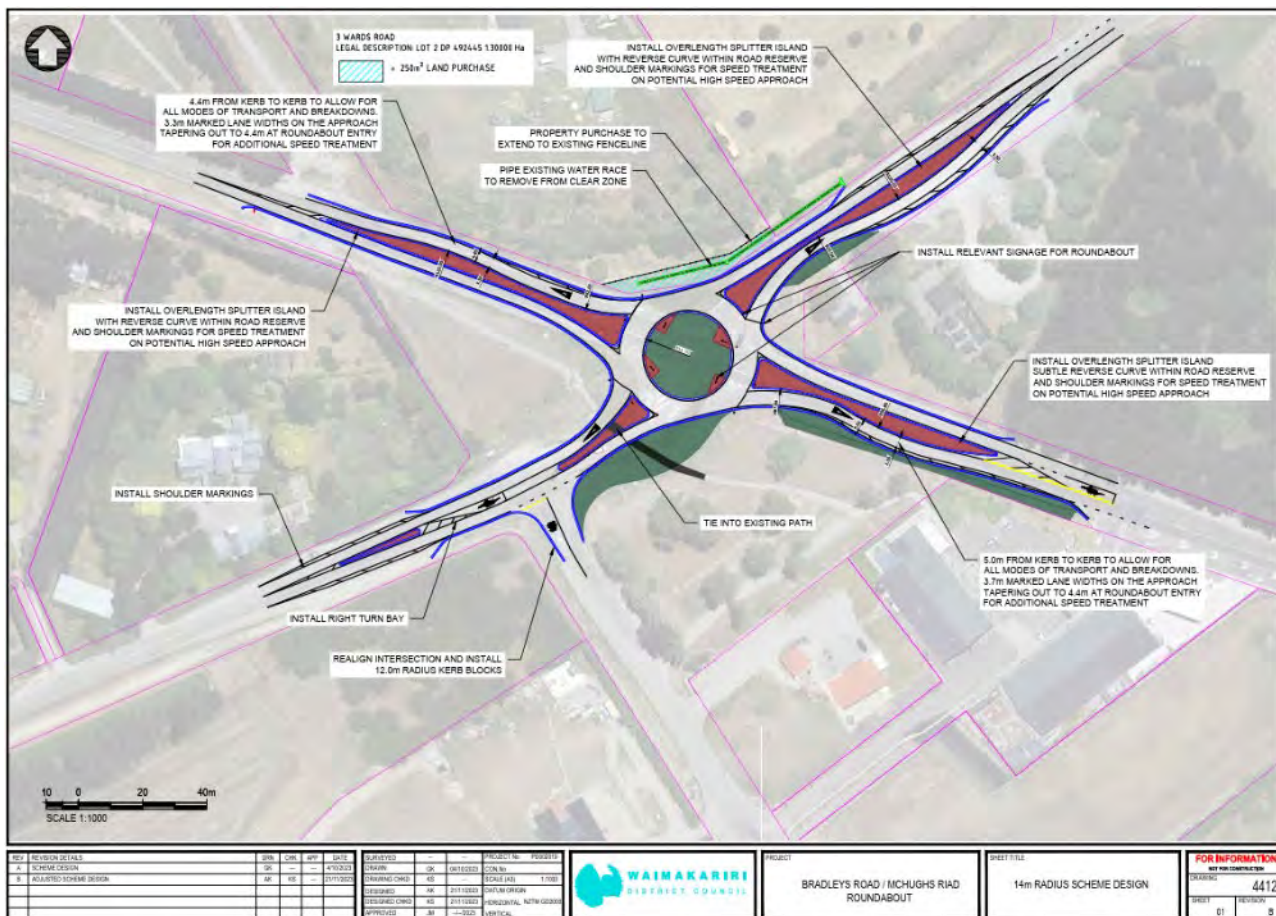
Council Proposed Tram Road / Bradleys Road / McHugh's Road Roundabout
